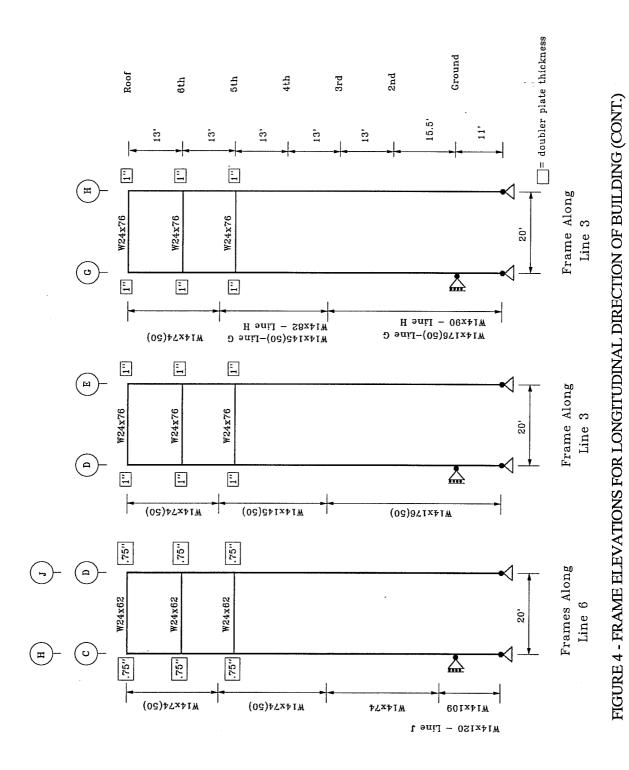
FRAME ELEVATIONS FOR LONGITUDINAL DIRECTION OF BUILDING
